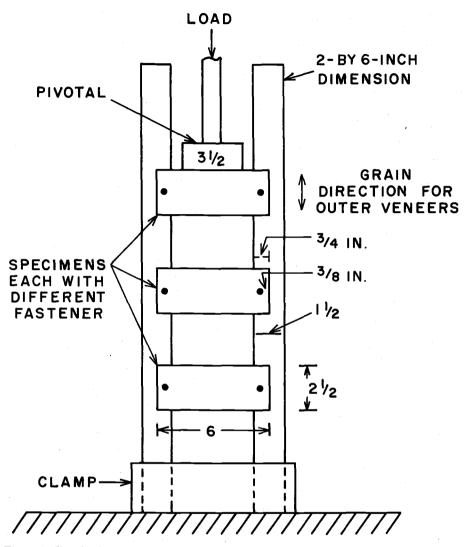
Sketch of specimens and test apparatus. The steel load head,  $3\frac{1}{2}$  inches wide along the specimen and 1 inch deep, was pivoted to allow tilting in one direction.
